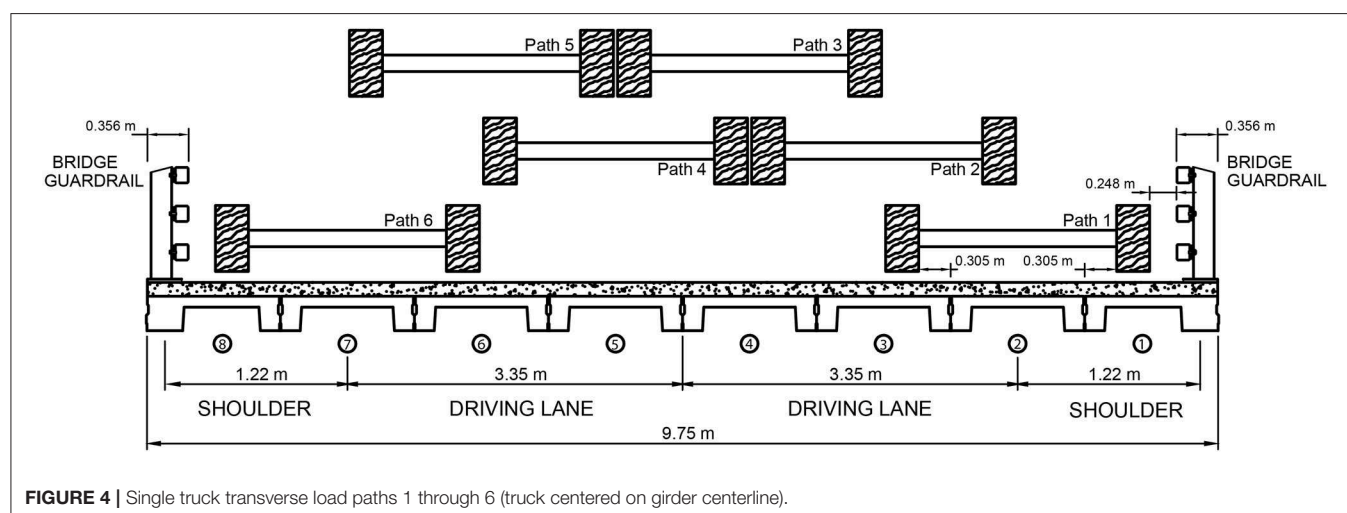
| Single truck transverse load paths 1 through 6 (truck centered on girder centerline).
